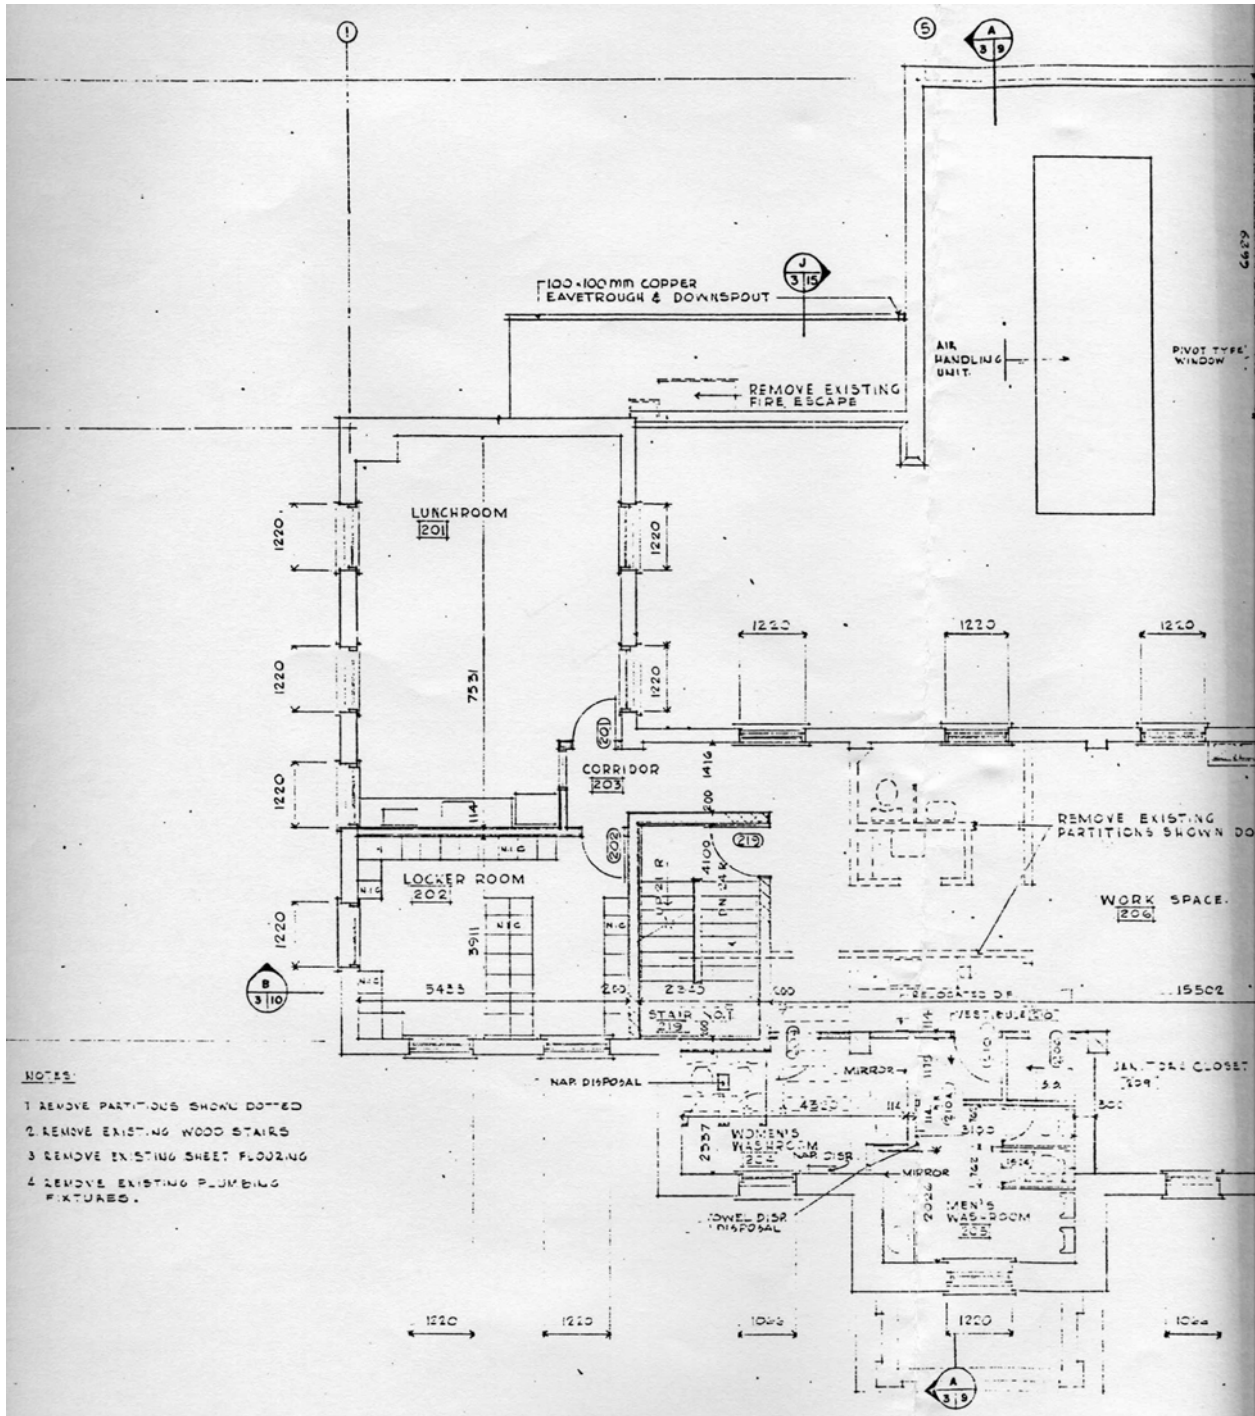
Drawing No. A3: East half of the second floor plan from the 1978 set of drawings for proposed renovations and additions, showing the new Locker Room and Lunchroom in the east wing, the new central concrete block stairwell and the reconfiguration of the washrooms.
